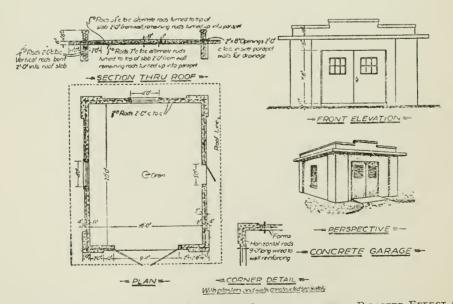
A PLAN FOR A GARAGE OF MONOLITHIC CONSTRUCTION WITH PILASTER EFFECT AT CORNERS.
